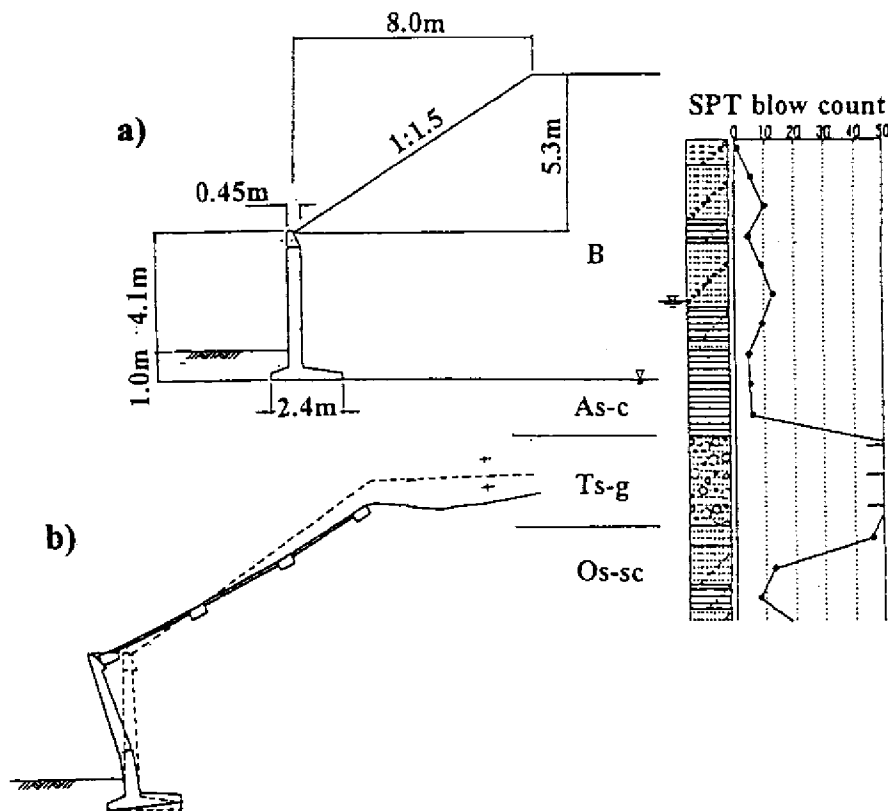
Cantilever-type RC RW at Shin-Nagata site;
